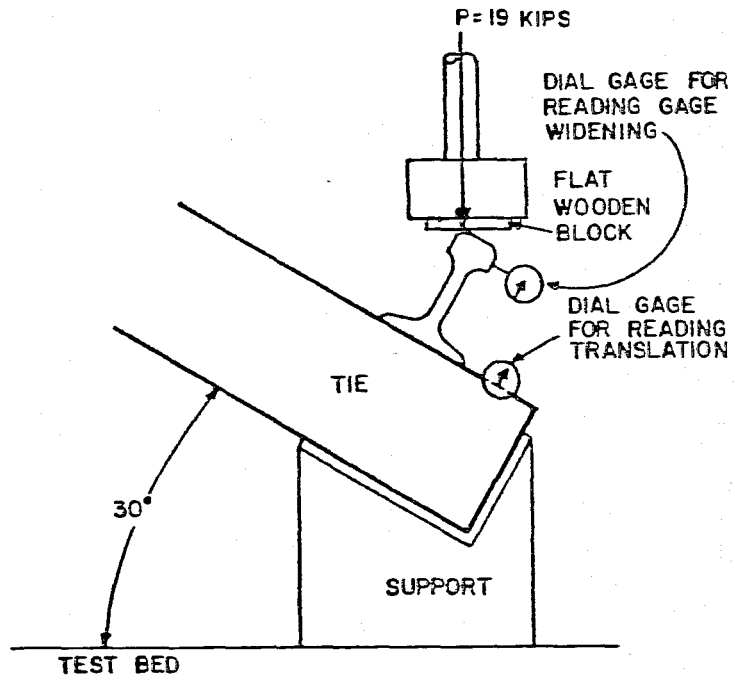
RAIL FASTENING LATERAL RESTRAINT TEST
